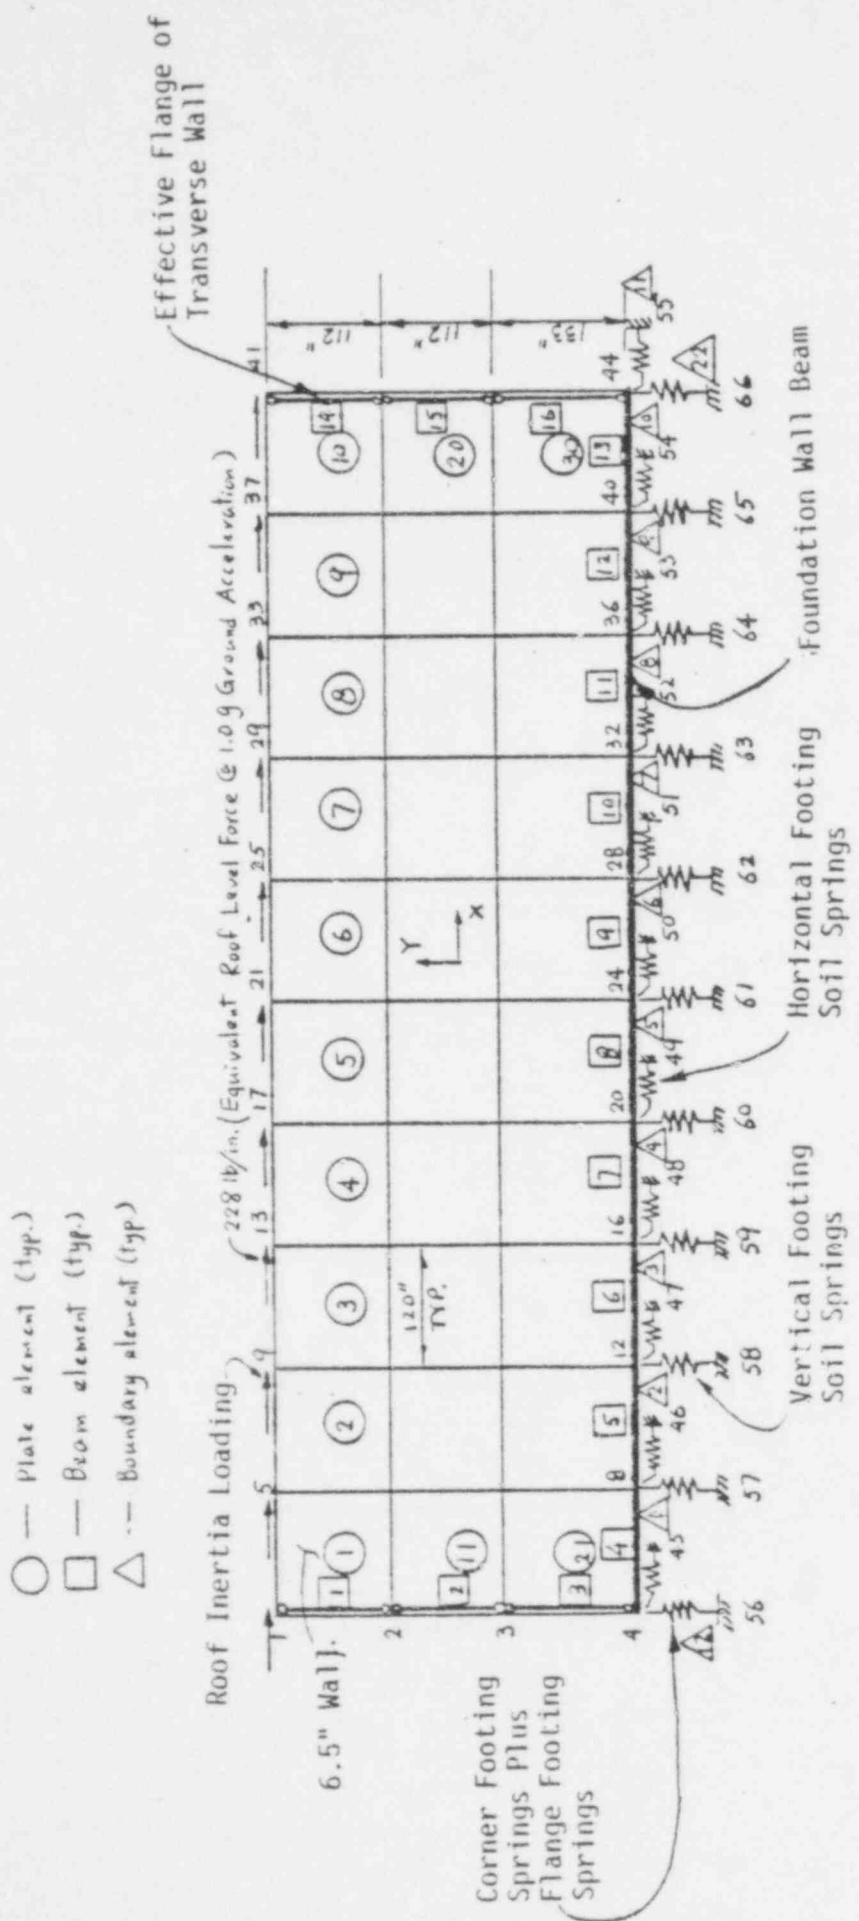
FINITE ELEMENT MODEL OF SOUTH WALL
